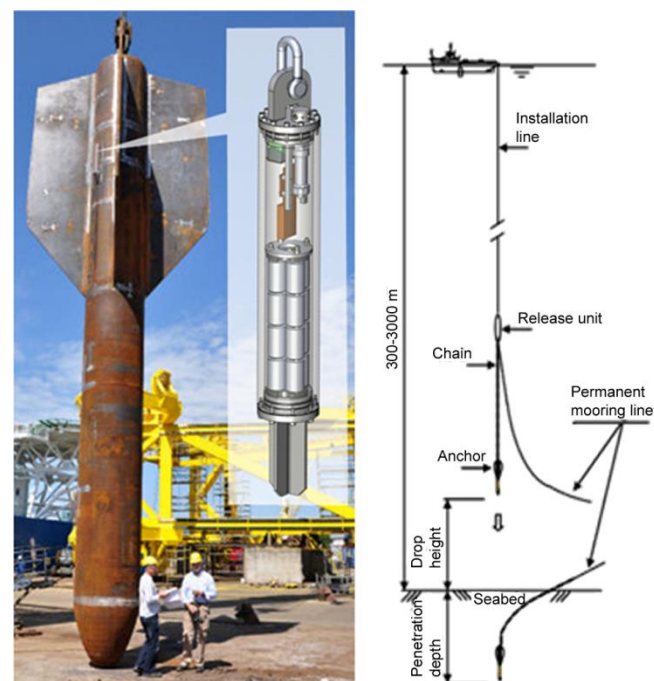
Instrument module attached to a typical full size drop anchor installed at the Gjøa field in the North Sea (Ref. Statoil and Deep Sea Anchor A/S)
